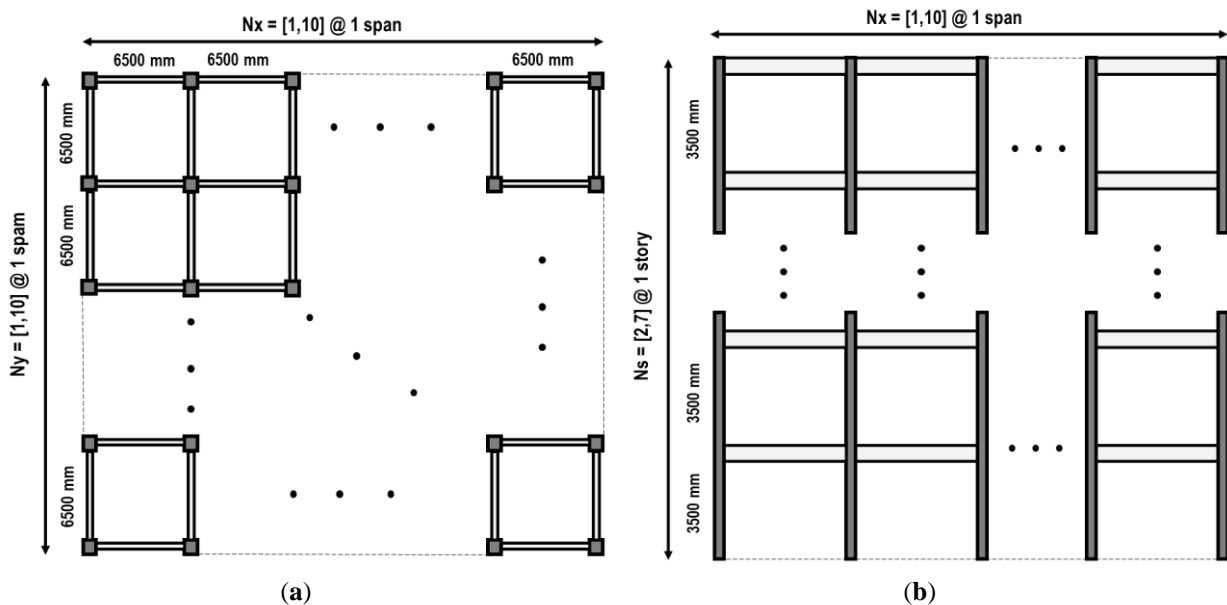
Archetype of buildings: (a) Plan view; (b) Elevation view.
